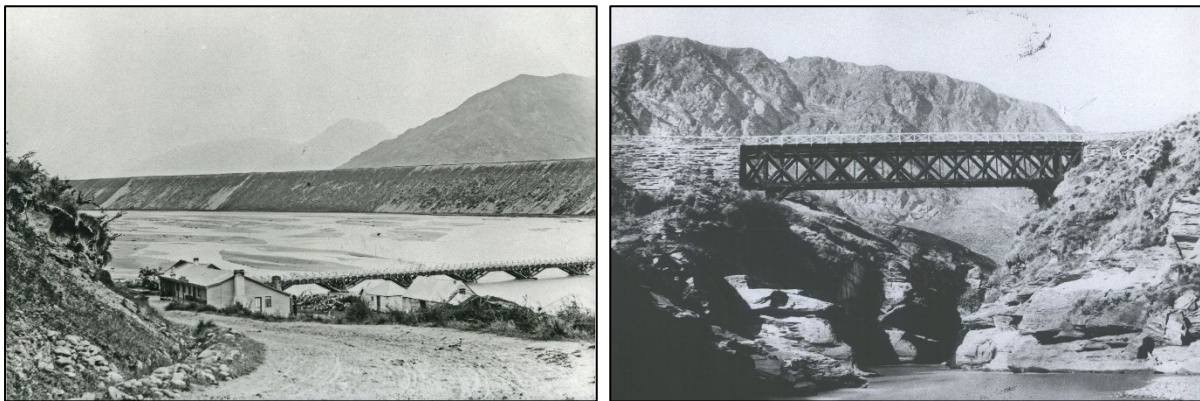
Lower Shotover Bridge, circa 1870s (left) and Arthurs Point bridge circa 1880 (right).²³
